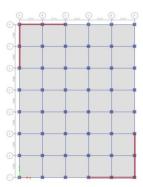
Plan view of modelled reinforced concrete structure system with shear wall
